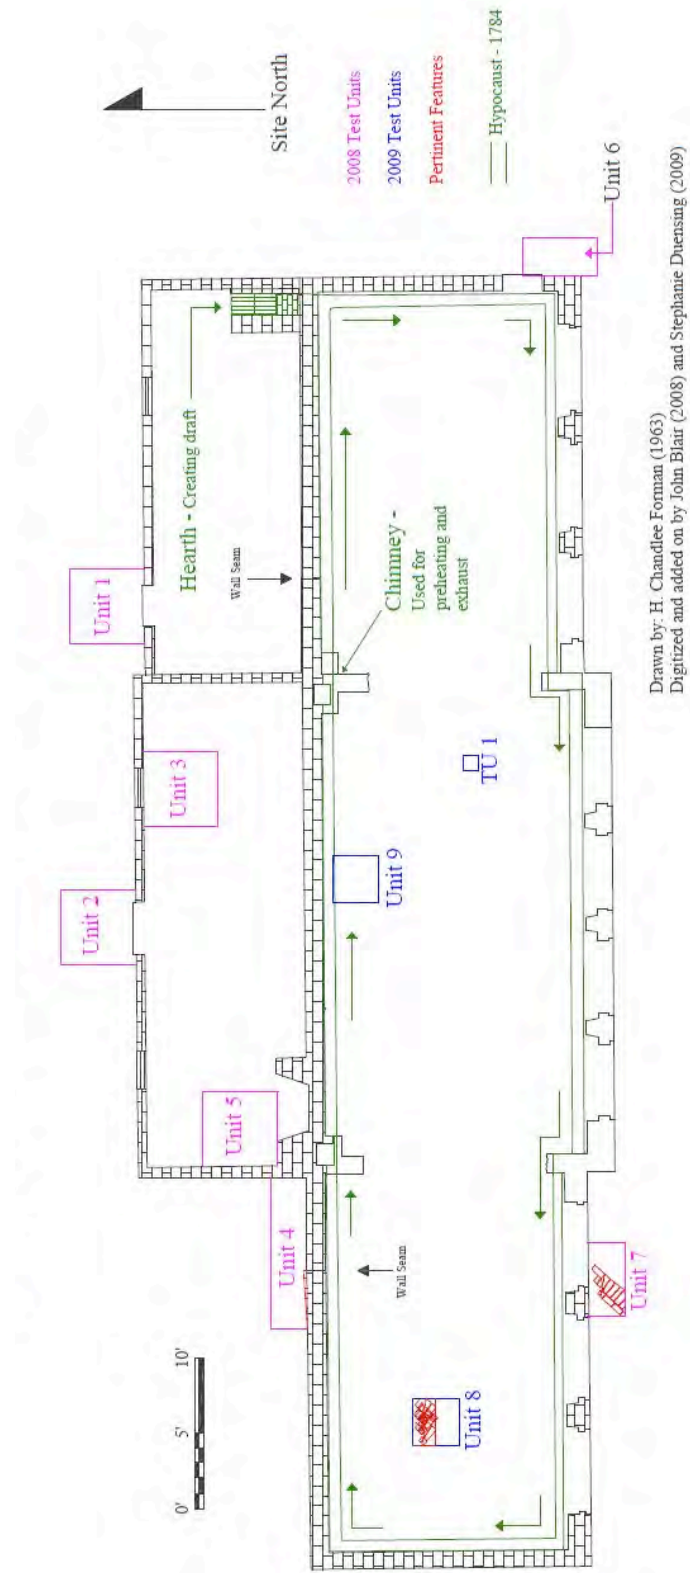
Greenhouse test units based off of H.C. Forman drawing of building plan (Image by John E. Blair Jr. and Stephanie N. Duensing)
